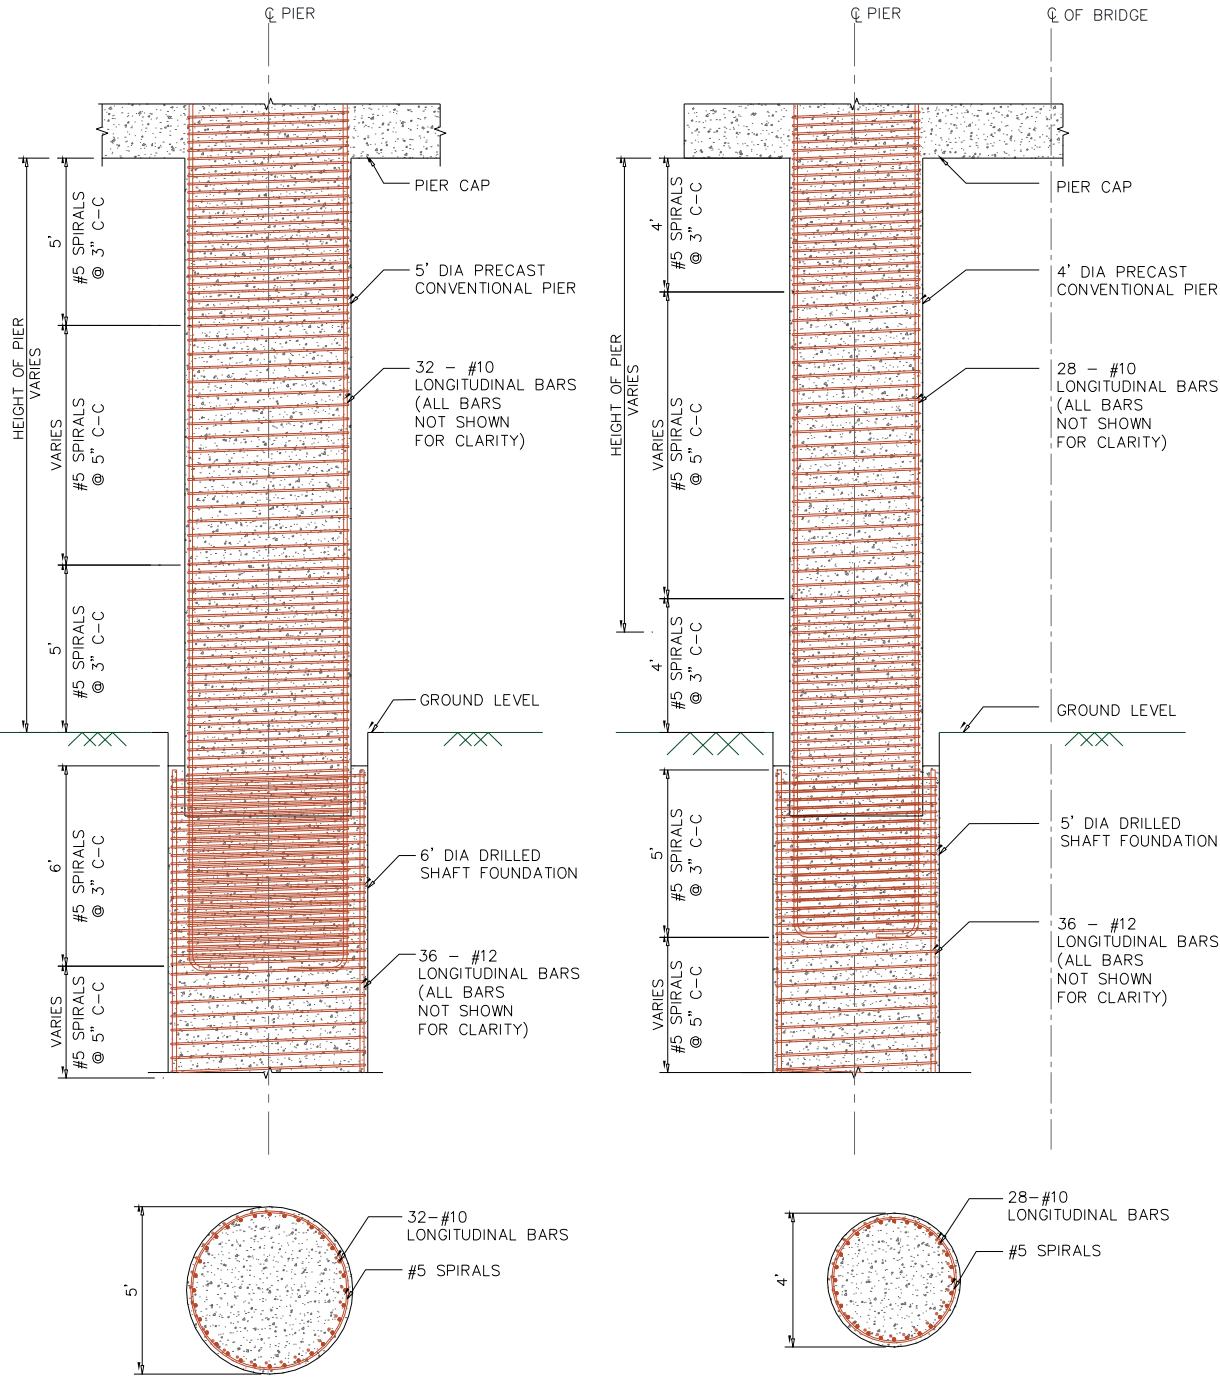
Reinforcement Detail of Single and Twin Conventional Pier
